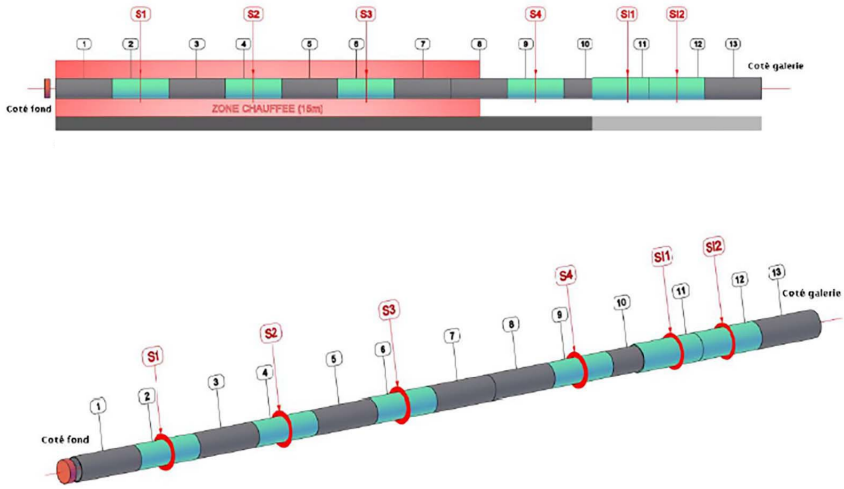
Location of the sleeve sections and insert sections equipped with sensors.
